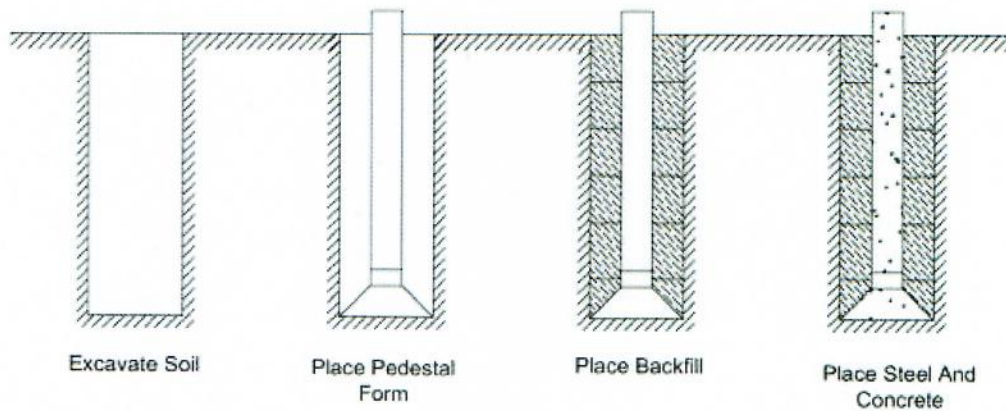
Typical Construction Sequence for Shallow Cast-in-Place Backfilled Pedestal.
